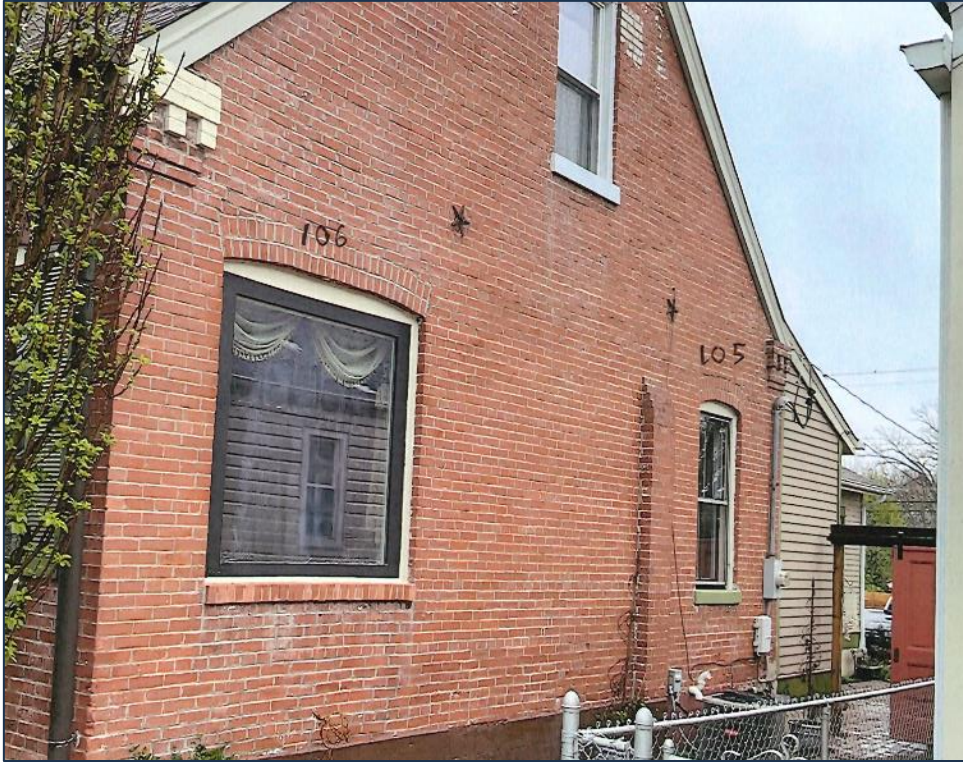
South side of dwelling (2 first-floor windows to be replaced).
